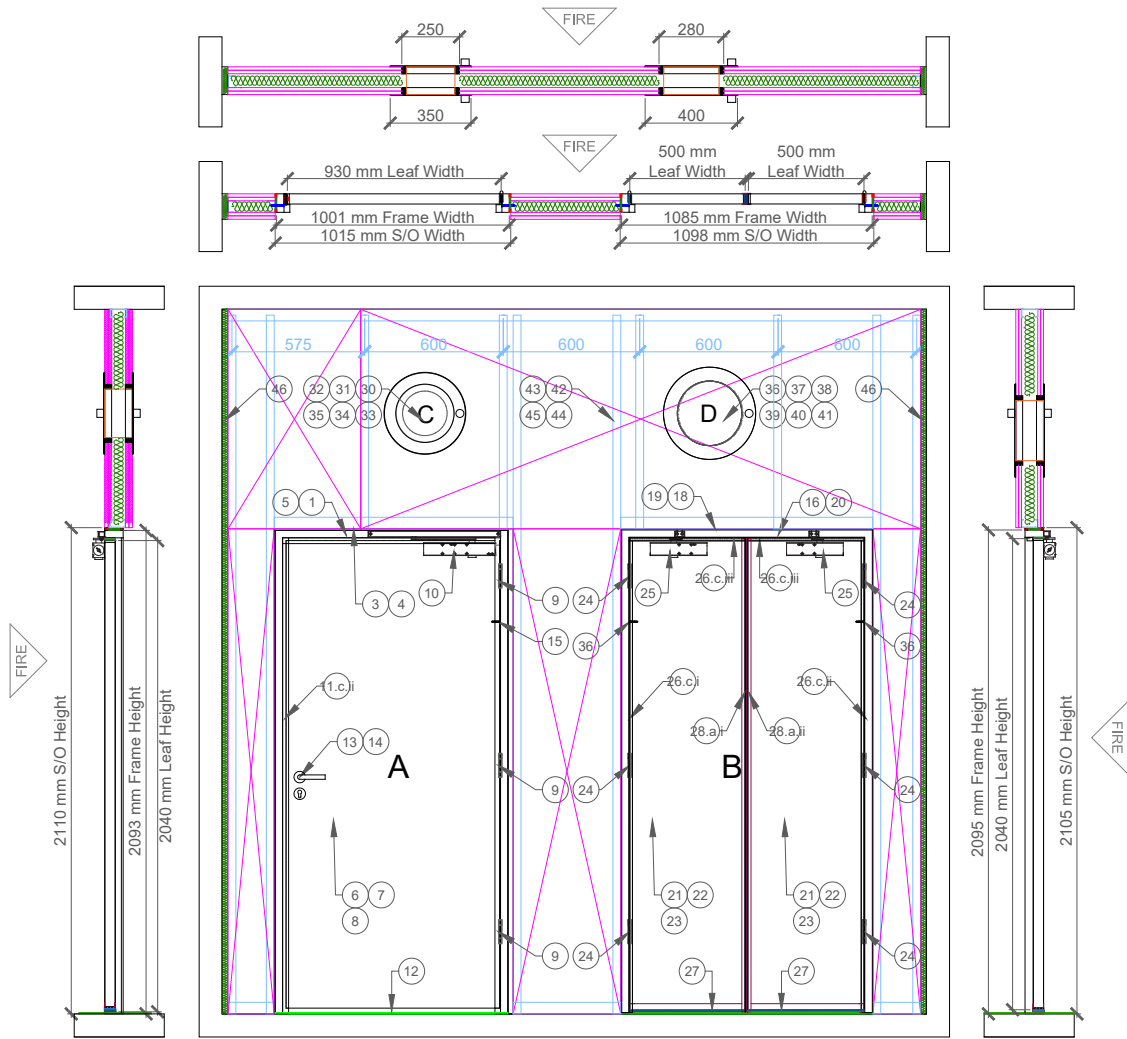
General arrangement of test construction viewed from the unexposed surface
